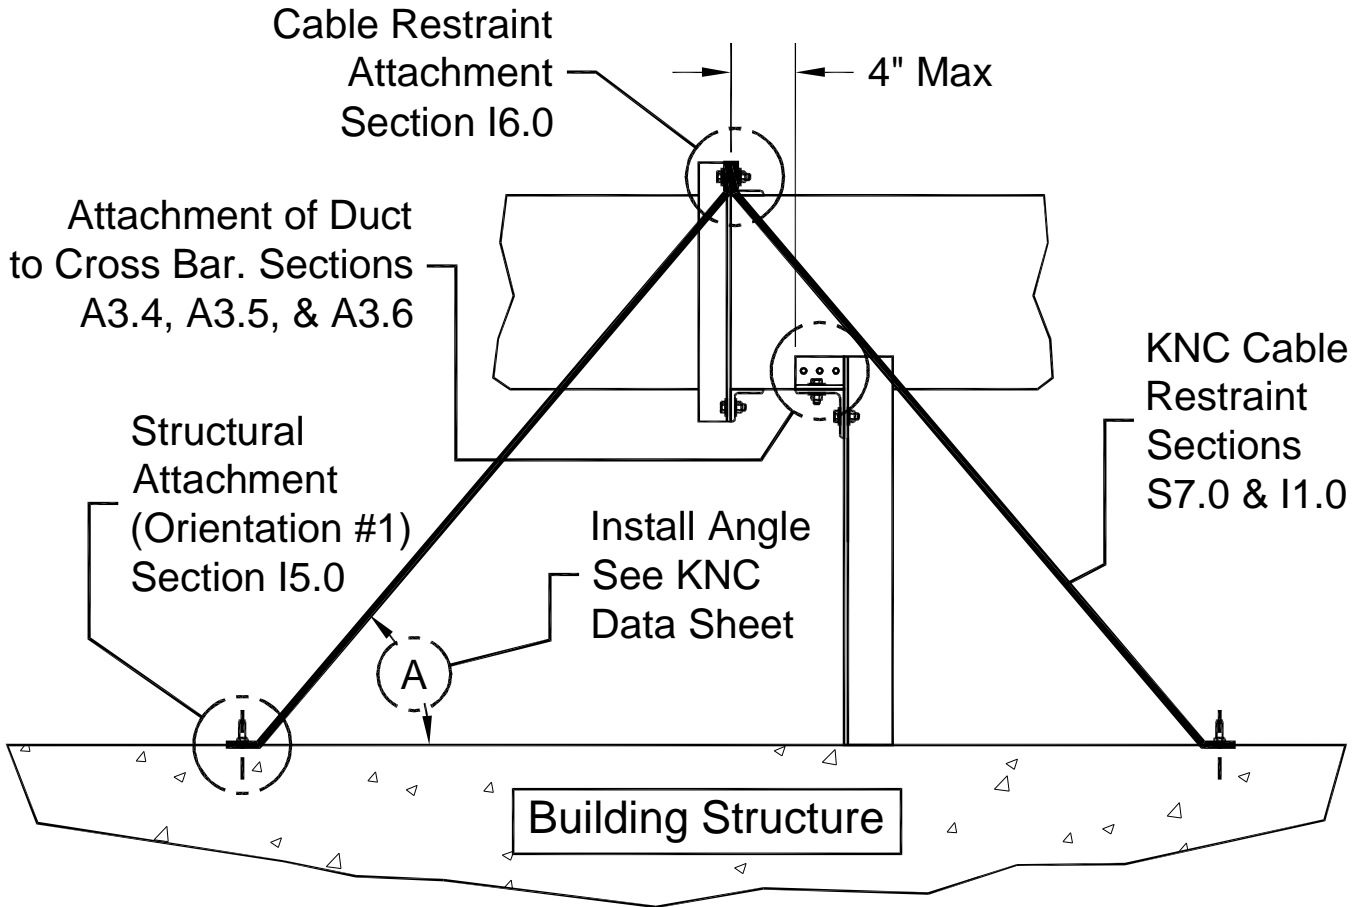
; Longitudinal (L) Cable Restraint Schematic Arrangement for Floor or Roof Mounted Duct – Restraints Attached to the Duct
